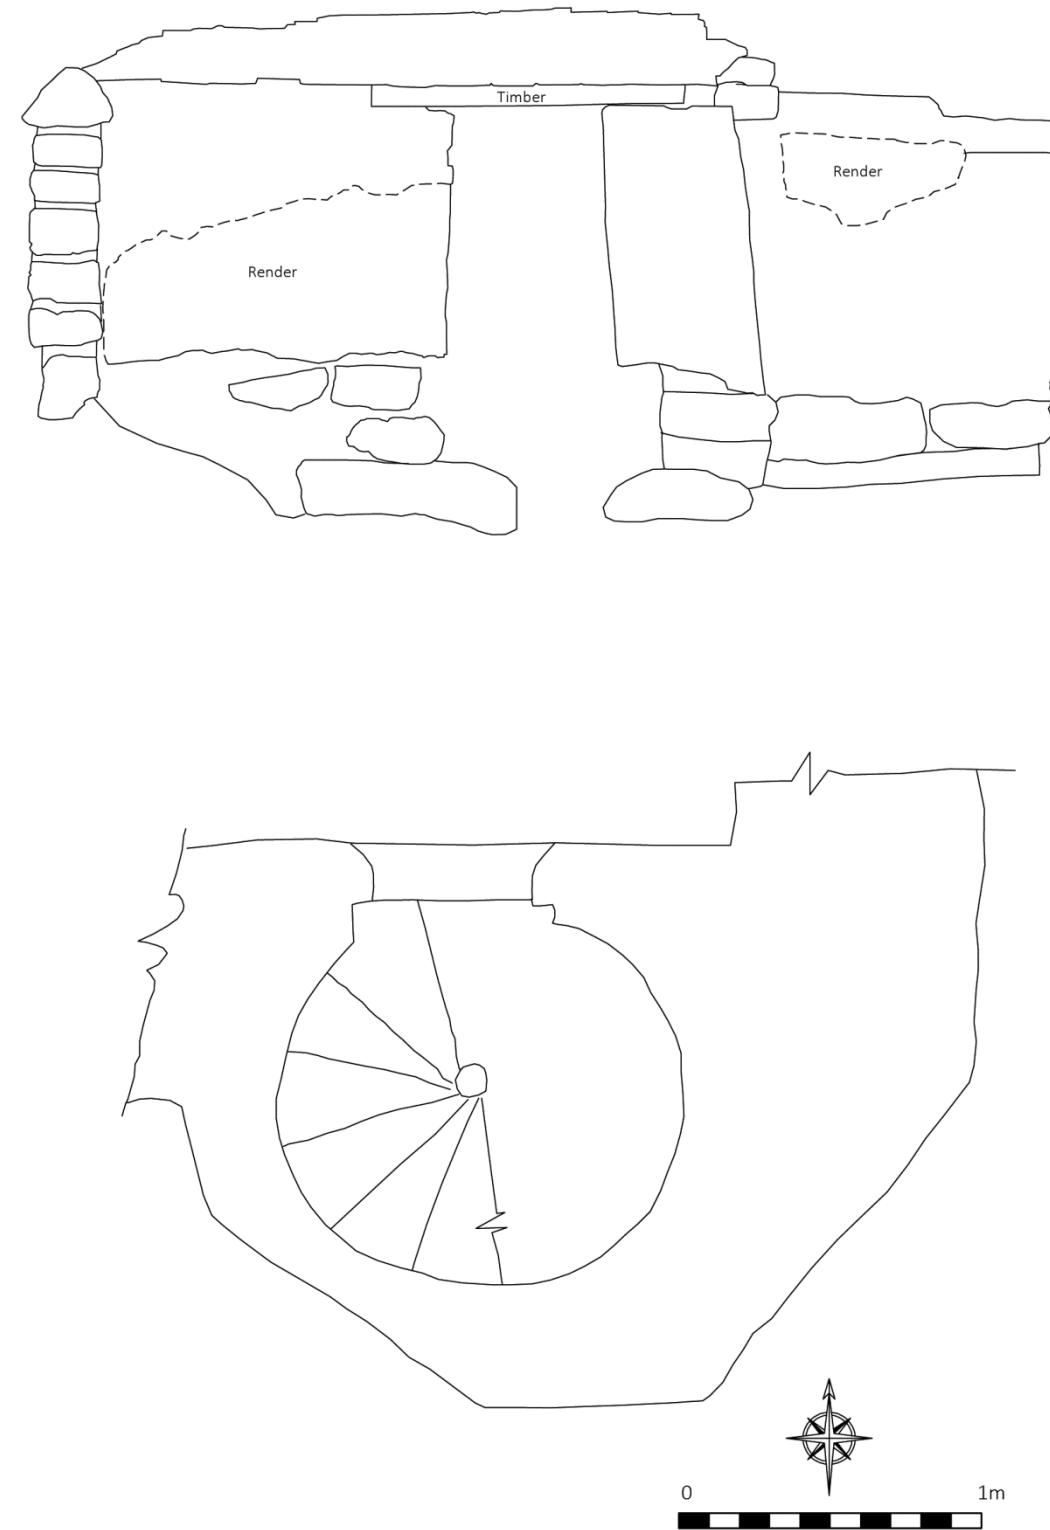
Stair Turret entrance and measured sketch plan (scale 1:25)
